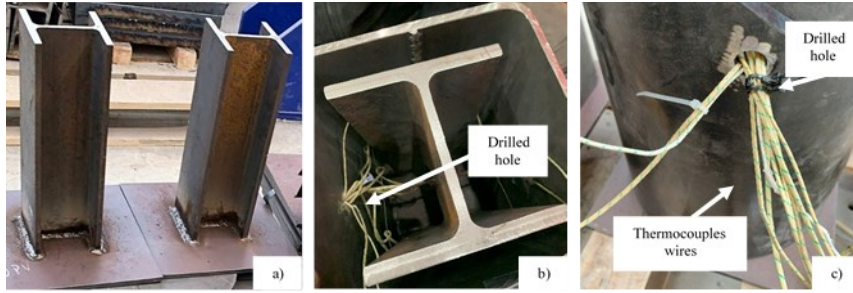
Columns preparation: a) Steel plate welded at bottom end of the embedded profile; b) Positioning of thermocouples; c) Positioning of hollow steel tube
